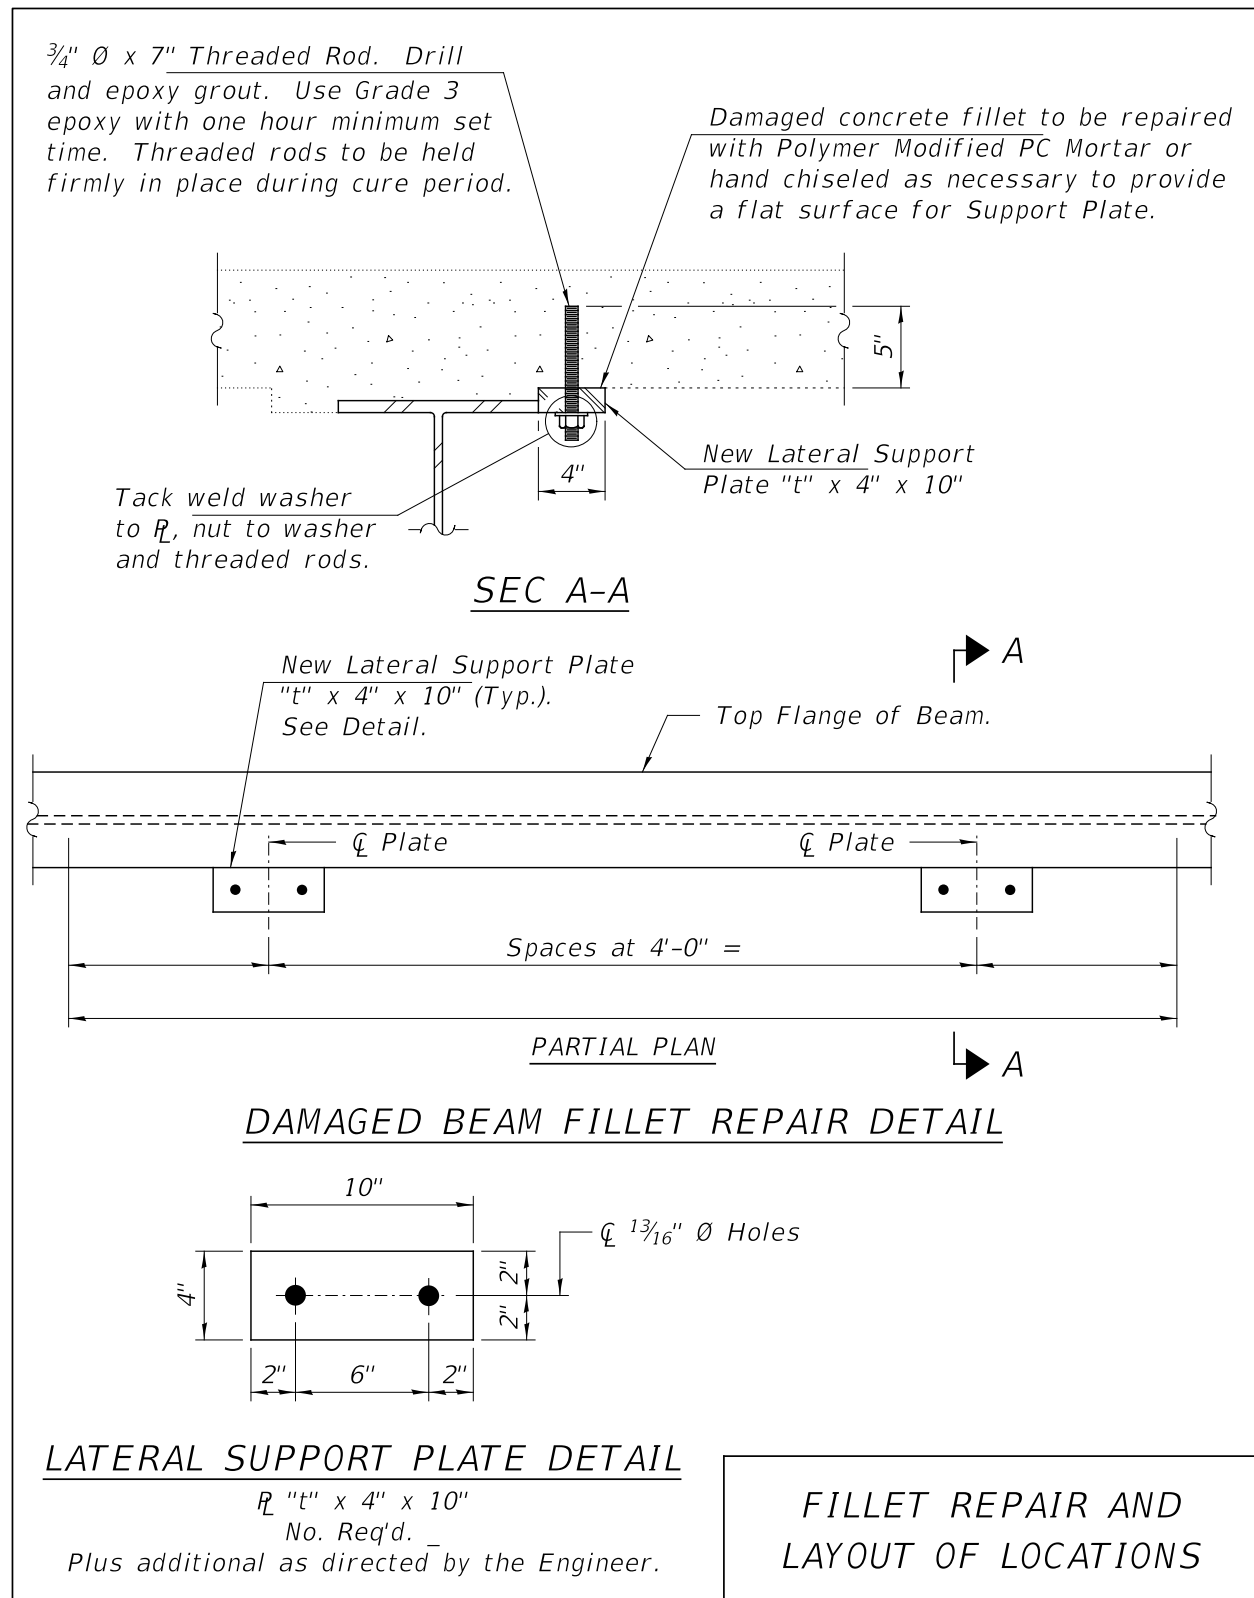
Fillet Repair and Layout of Locations
